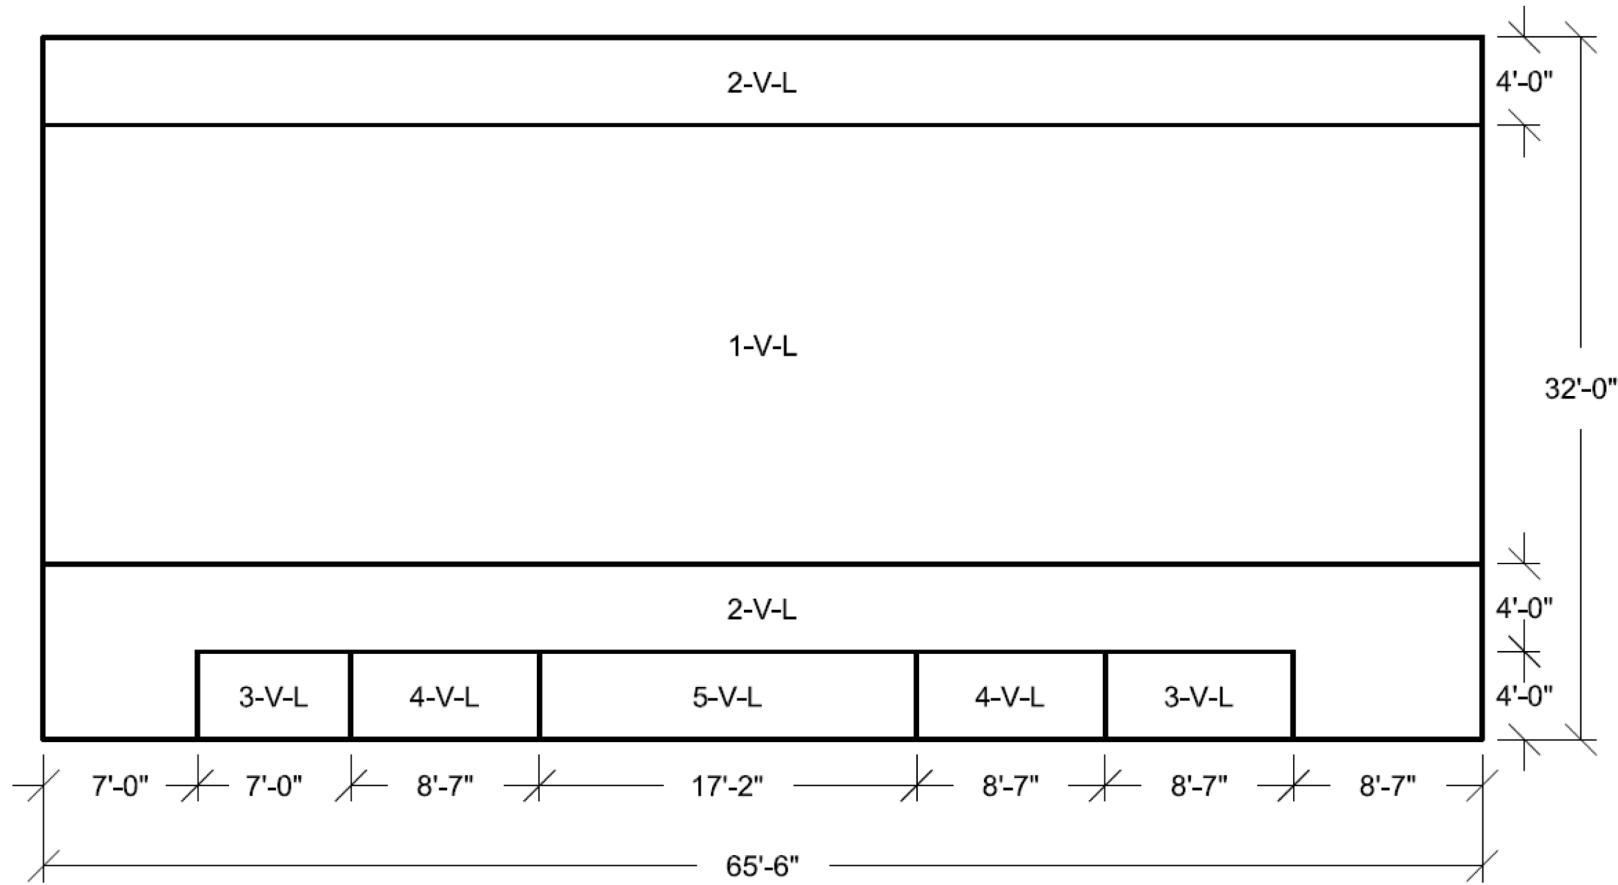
H.6-167 DGFOSV Wall 7 Looking From Outside Transverse Reinforcement Zones
